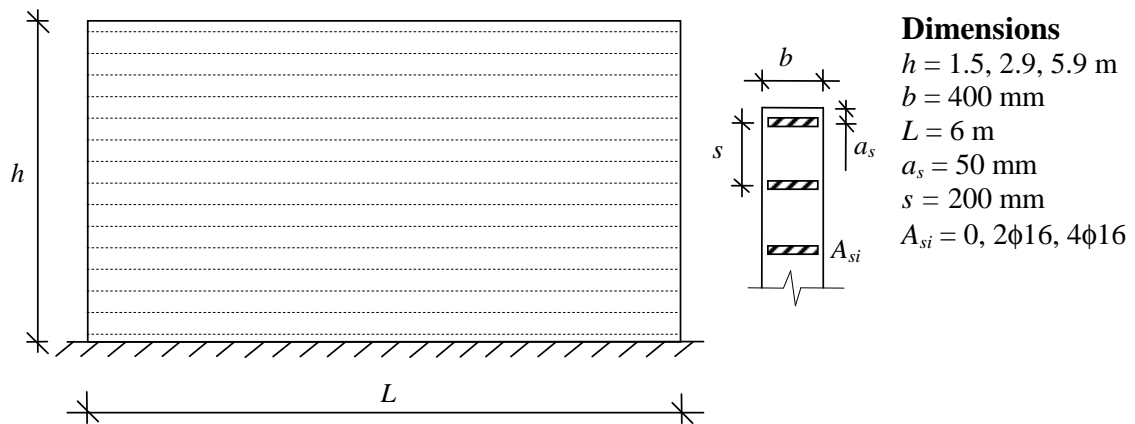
Geometry of the wall and schematic positioning of reinforcement.
